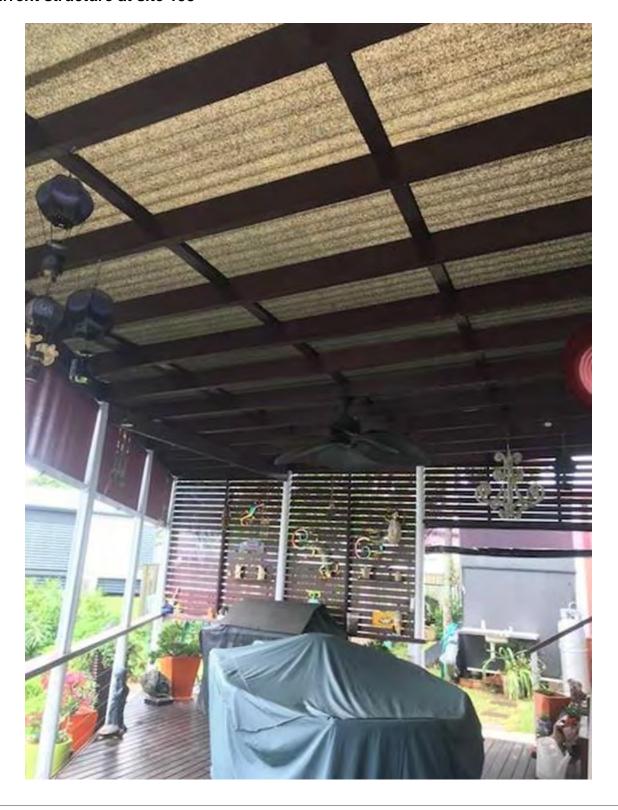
Demonstrates that the existing shade cloth has been covered with an impervious Alsanyte roof which has exceeded the allowable site coverage for the site.
